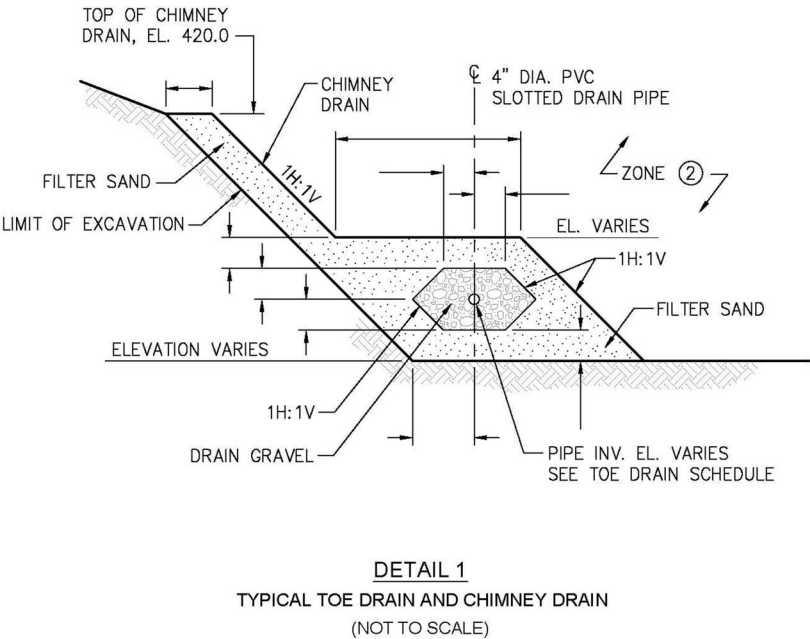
S-18. Dimensioning of Typical Toe Drain and Chimney Drain
